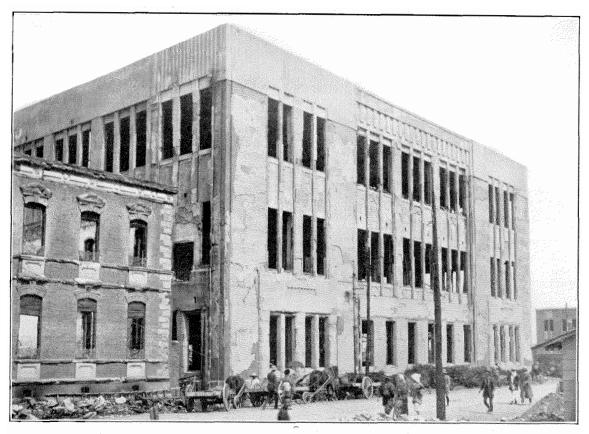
Outside View of Building After Fire, in which were located two units of Telephone Central, Hamacho and Horidome, Tokio. Reinforced concrete building to be used again as Common Battery Office. Brick building to left is Central Naniwa
